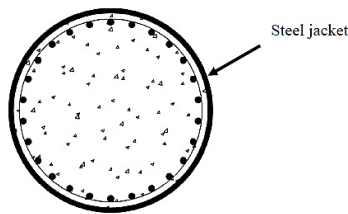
Steel jacket retrofit on circular reinforced concrete columns (Chai et al., 1991).
